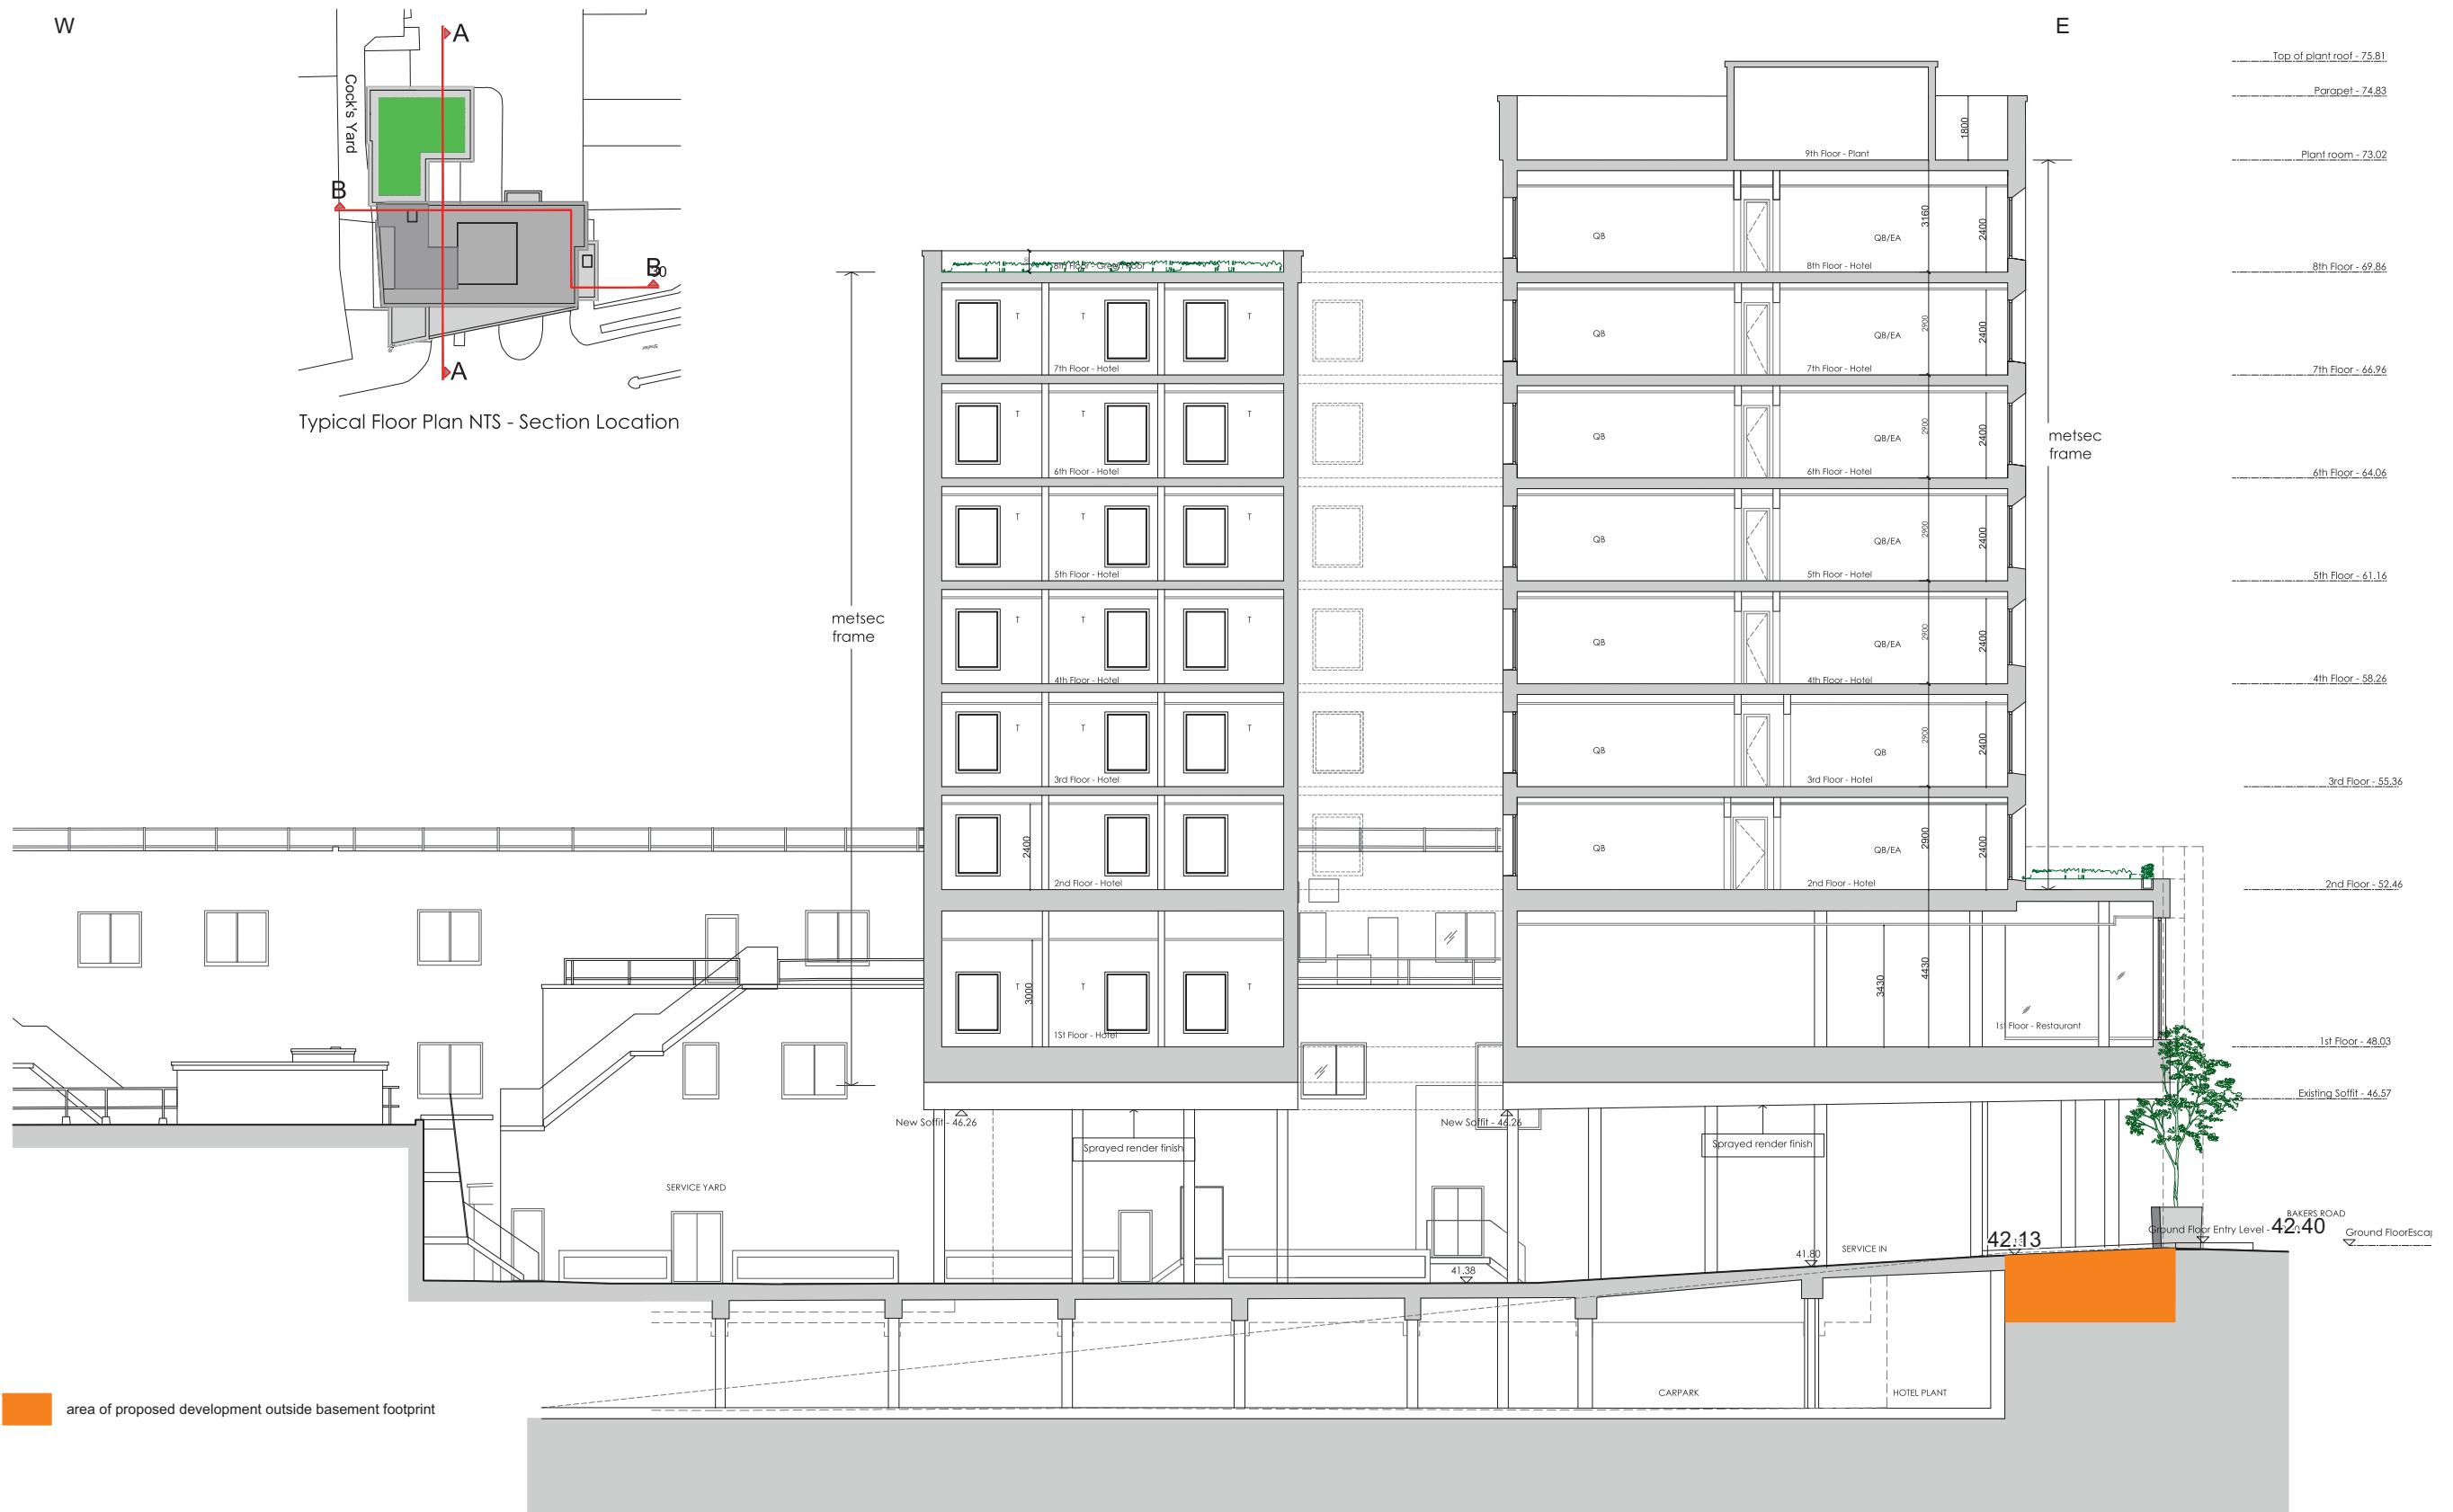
South-east facing section of the proposed development (Gaunt Francis architects, drawing no 12024/PL-S 300, Rev C, 12/12/2018)
